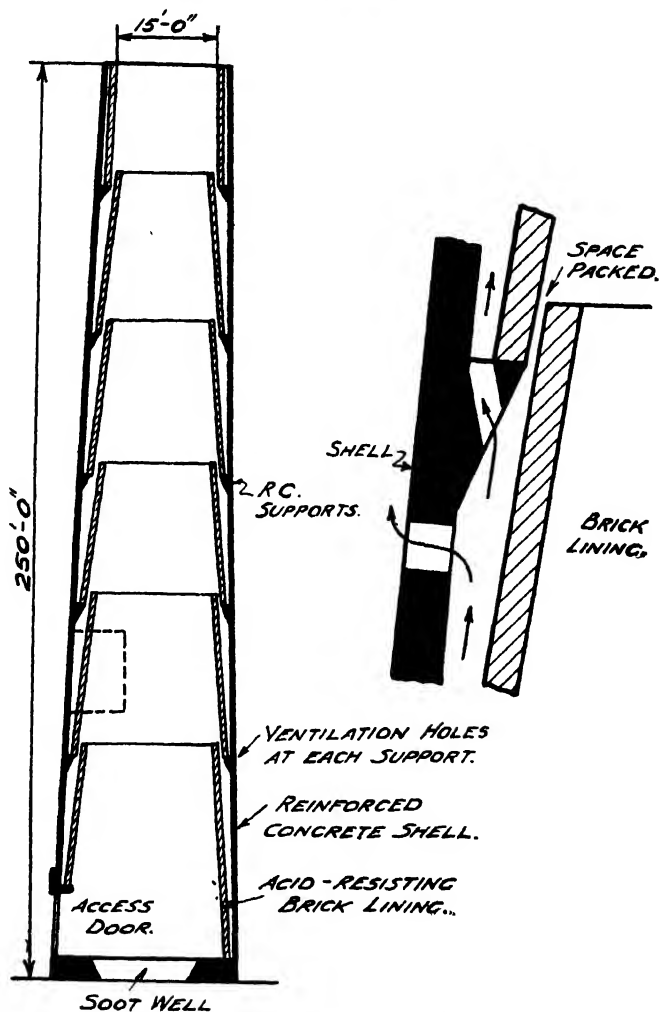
Reinforced Concrete Chimney Details. (Tileman.)
